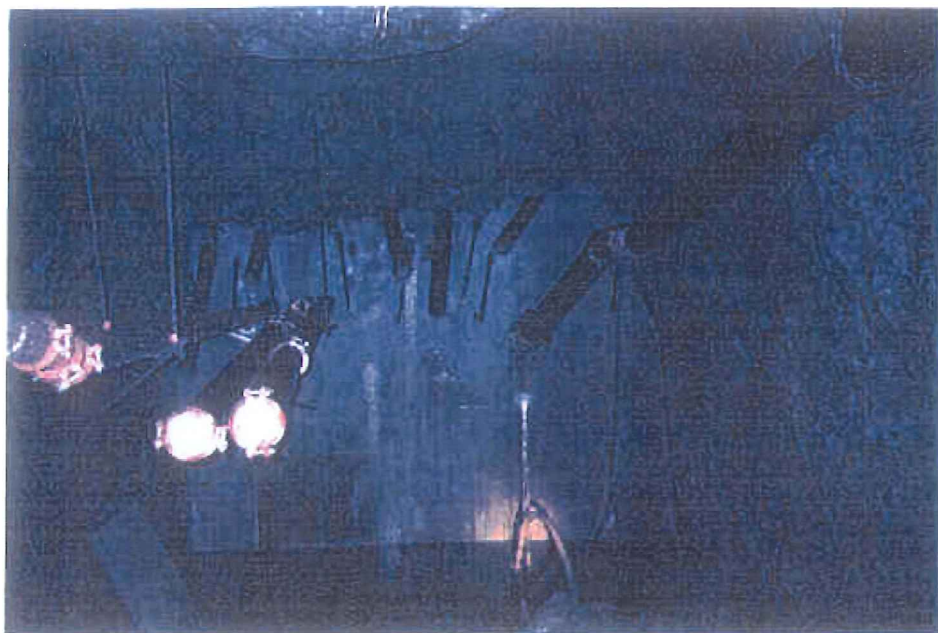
The Upper Bulkhead of the #14 storage cavern, partially flooded.
